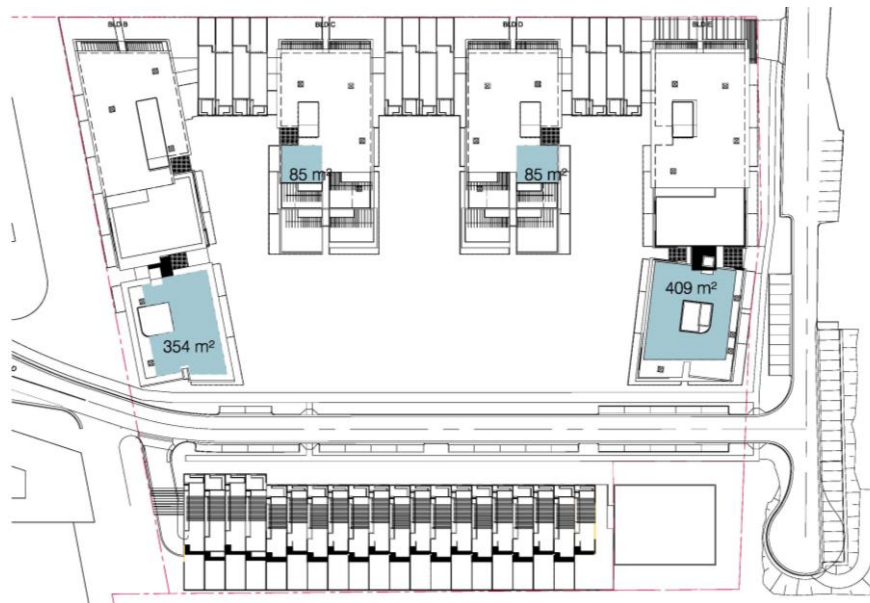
Proposed communal open space on Buildings B, C, D and E rooftops
